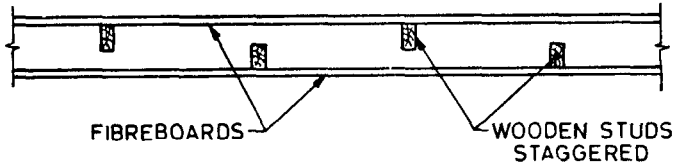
TYPICAL SECTIONAL PLAN OF A SOUND PROOF PARTITION
